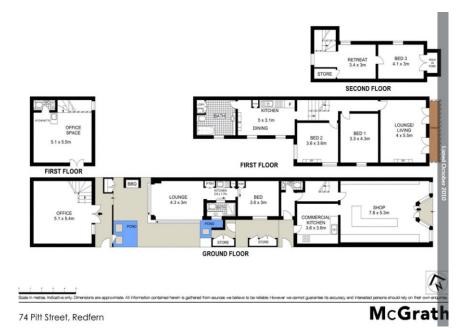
Real estate floorplan for 74 Pitt Street, Redfern.
